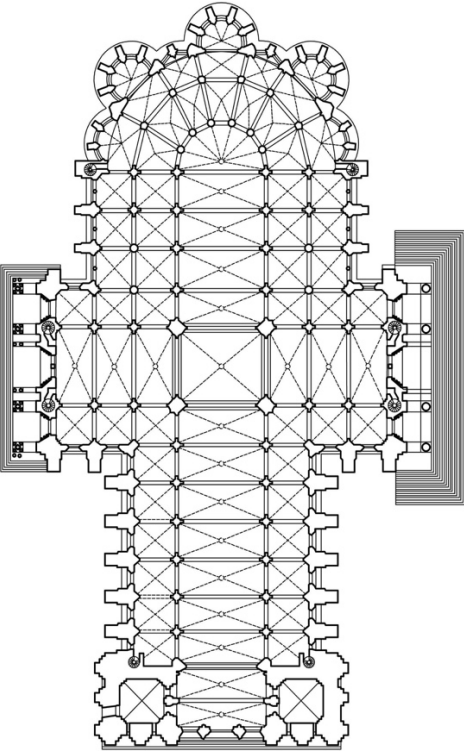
Floor plan of Chartres Cathedral, France. 1220.
